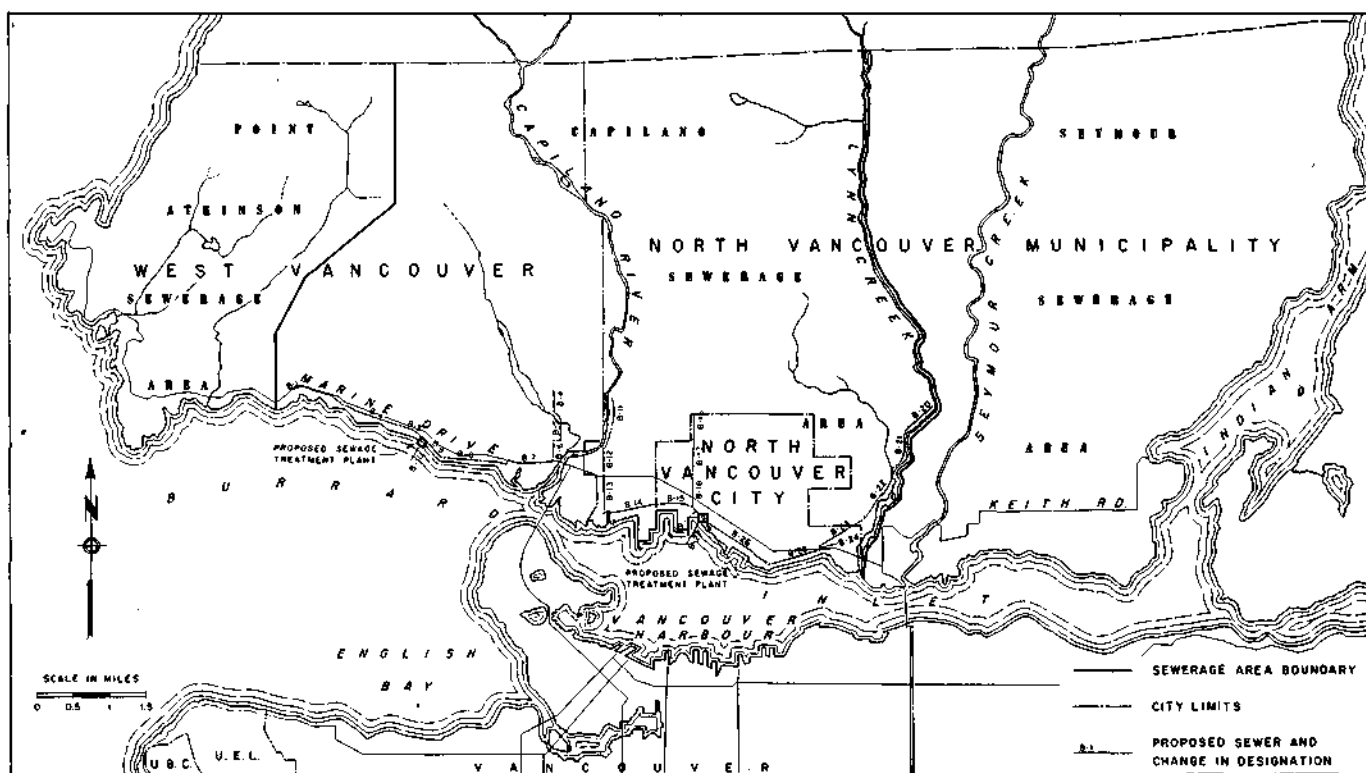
Proposed Layout of Plan B - Capilano Sewerage Area
